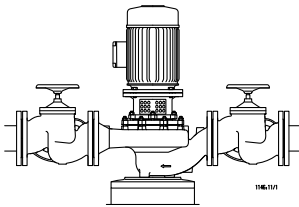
Vertical installation / mounted on pump foot (grey cast iron, accessory), sizes 100-100-160 to 200-200-315
